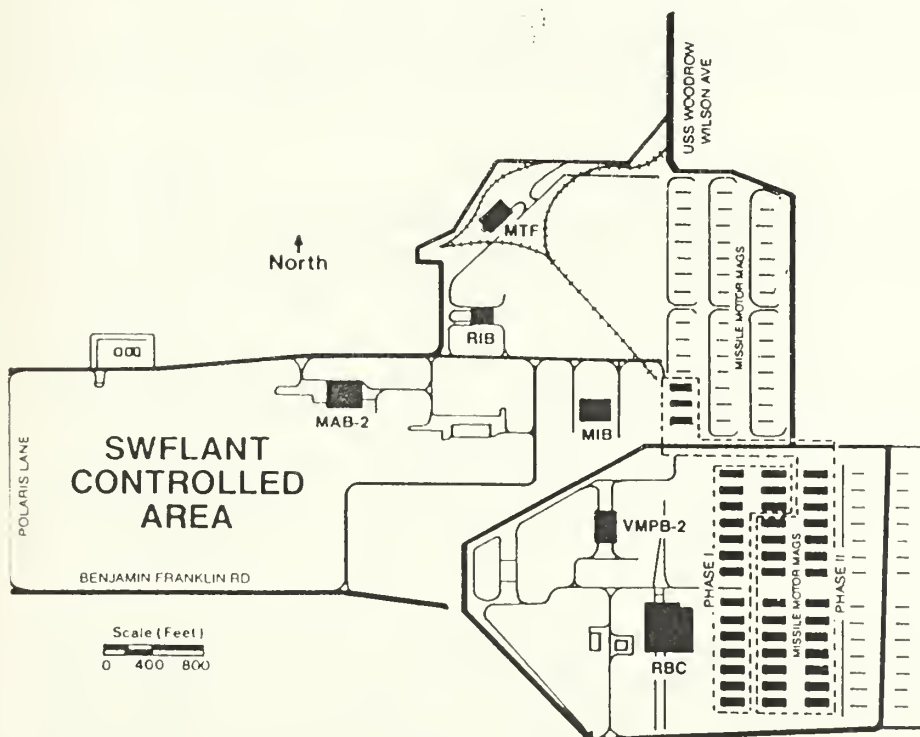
Site Plan of SWFLANT Area. (Hussin, 1987)
